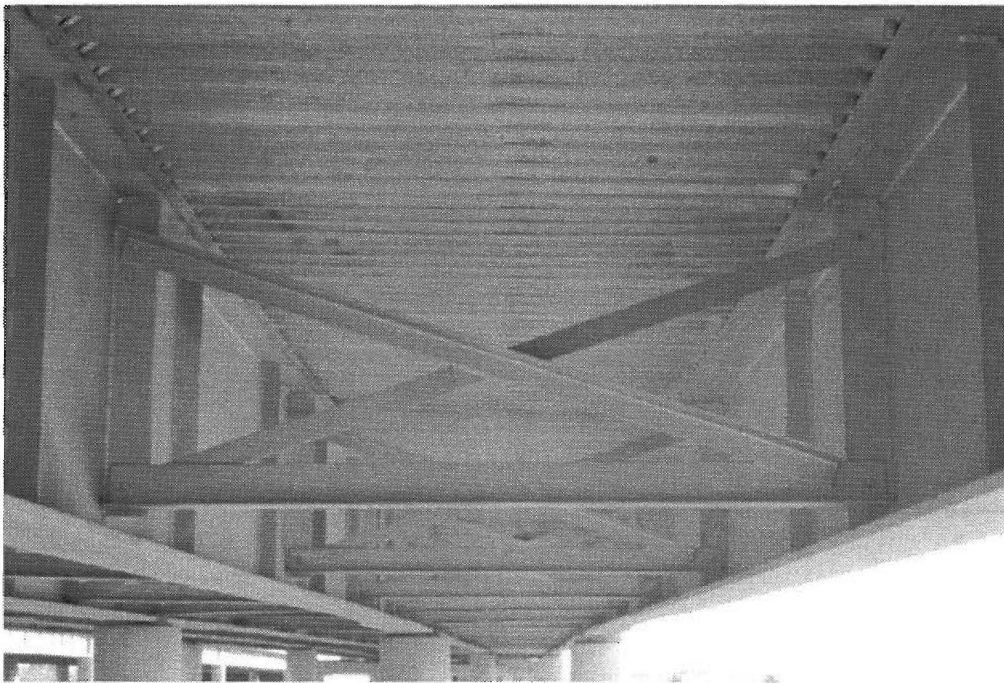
View of typical cross frame diaphragm at outer bay.
